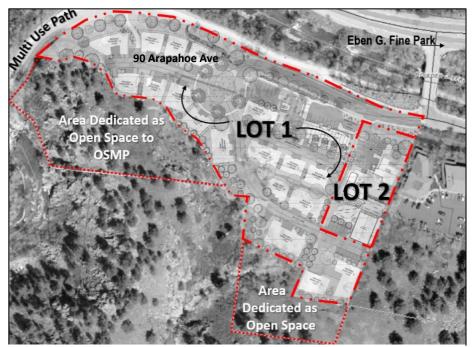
Site map showing two defined areas south of the site that were dedicated as open space
